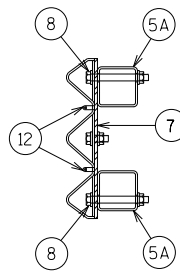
DETAIL AT END POST THRIE BEAM RAIL ATTACHMENT
